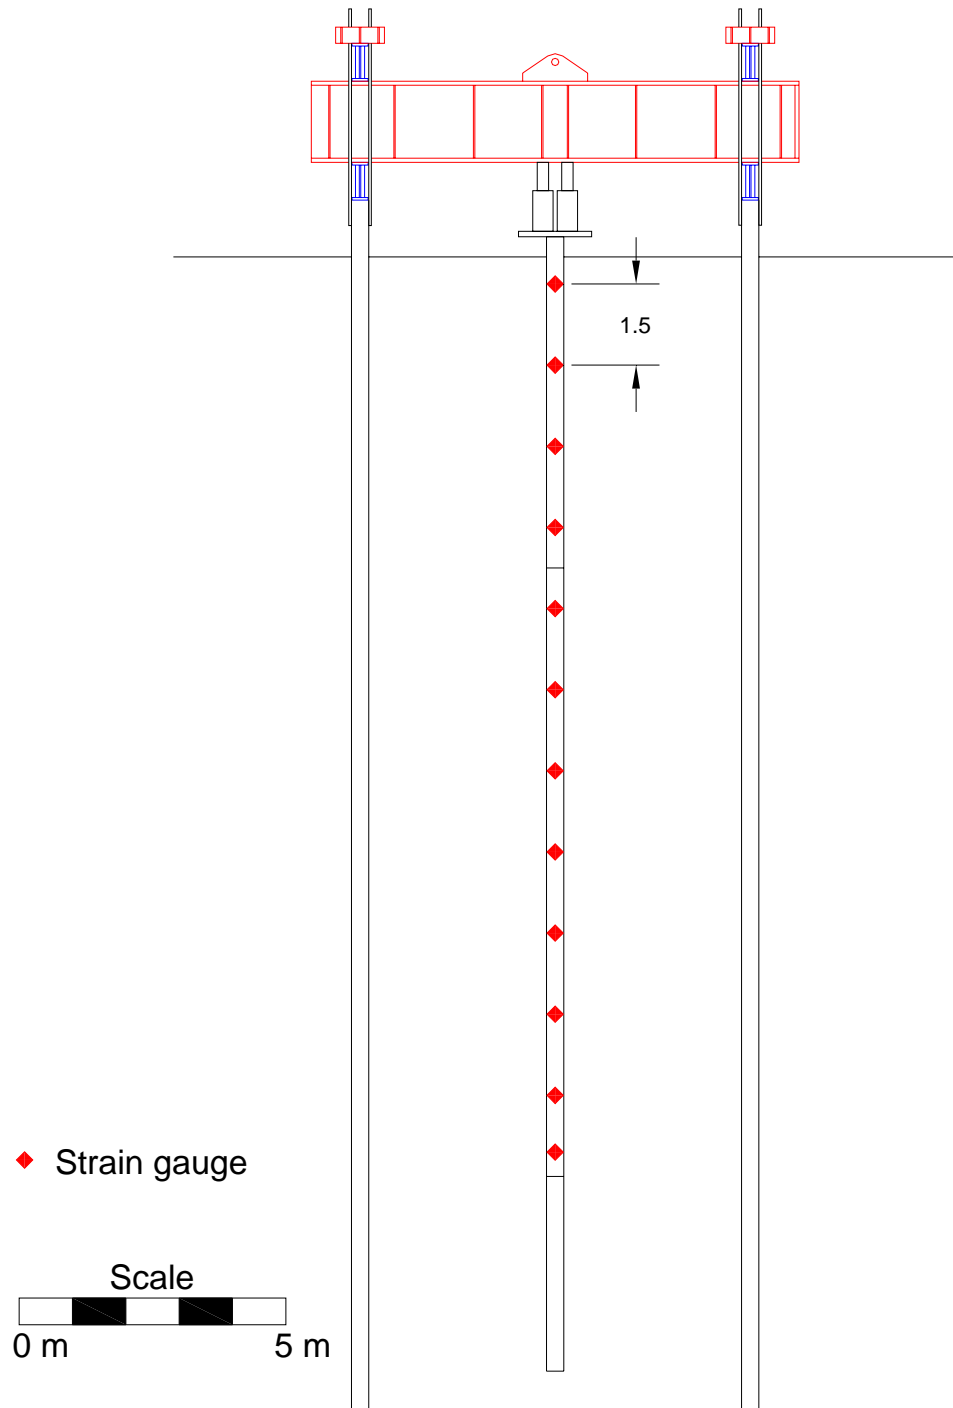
Profile view of pile foundations installed at both Sites 2 and 3.
